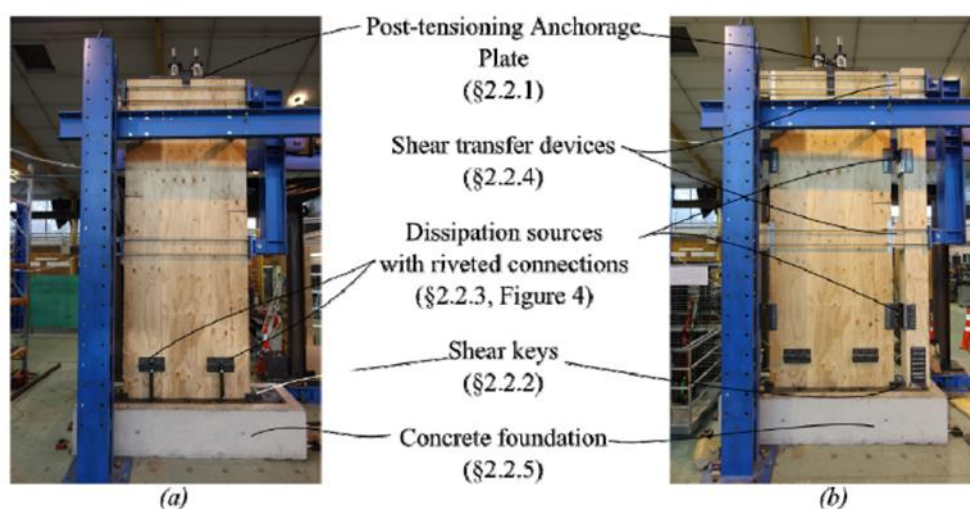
(a) Post-tensioned hybrid LVL walls, and (b) post-tensioned column-wall-column LVL walls with UFPs (photo taken from Sarti (2015))
